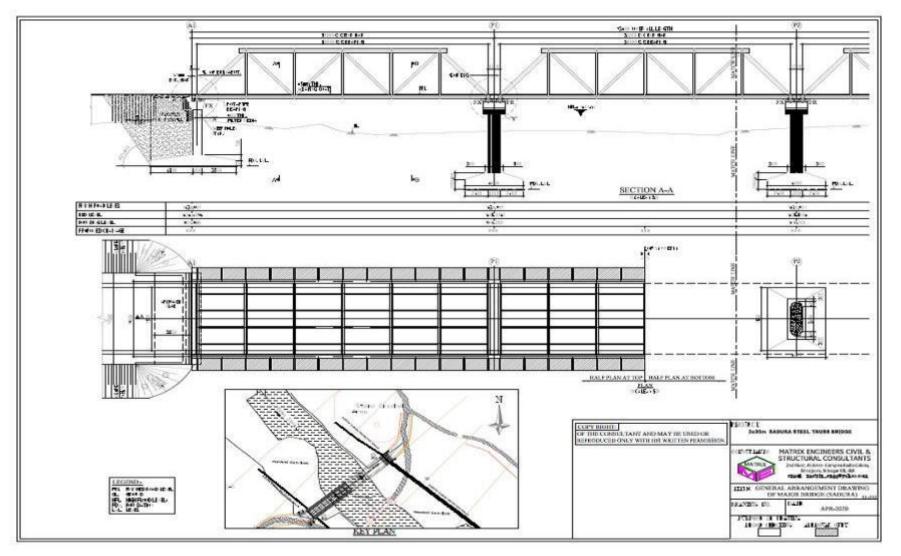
General Arrangement Drawing (GAD) of the Proposed Construction 3x30 meter Steel Trussed Girder Bridge over Bringi Nallah at Sadoora in District Anantnag
